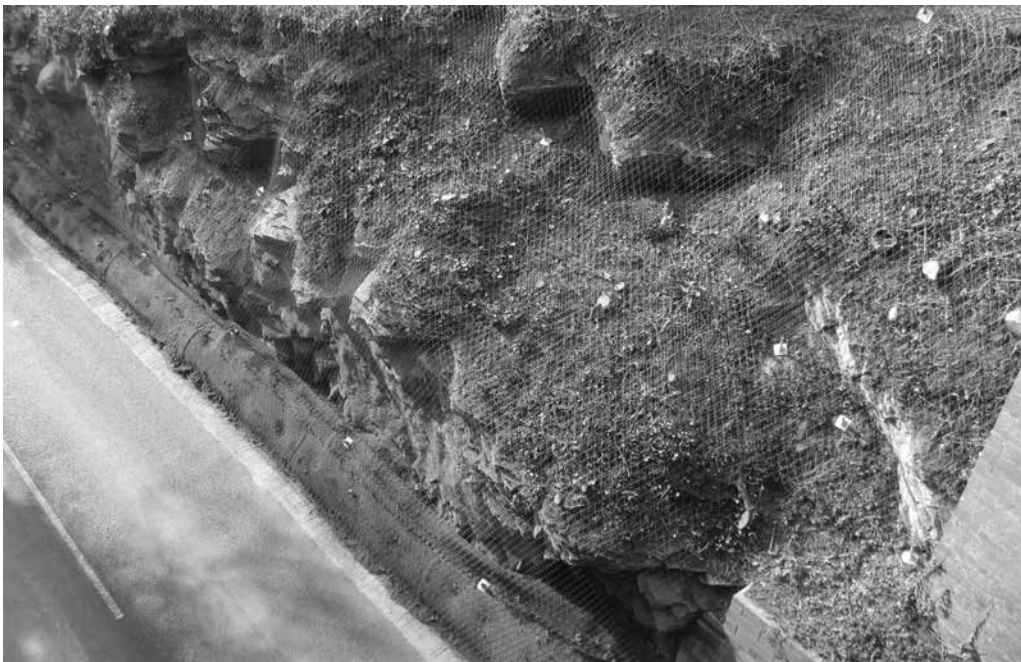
Stabilisation of the rock face at the Dry Arch, Goodrich
